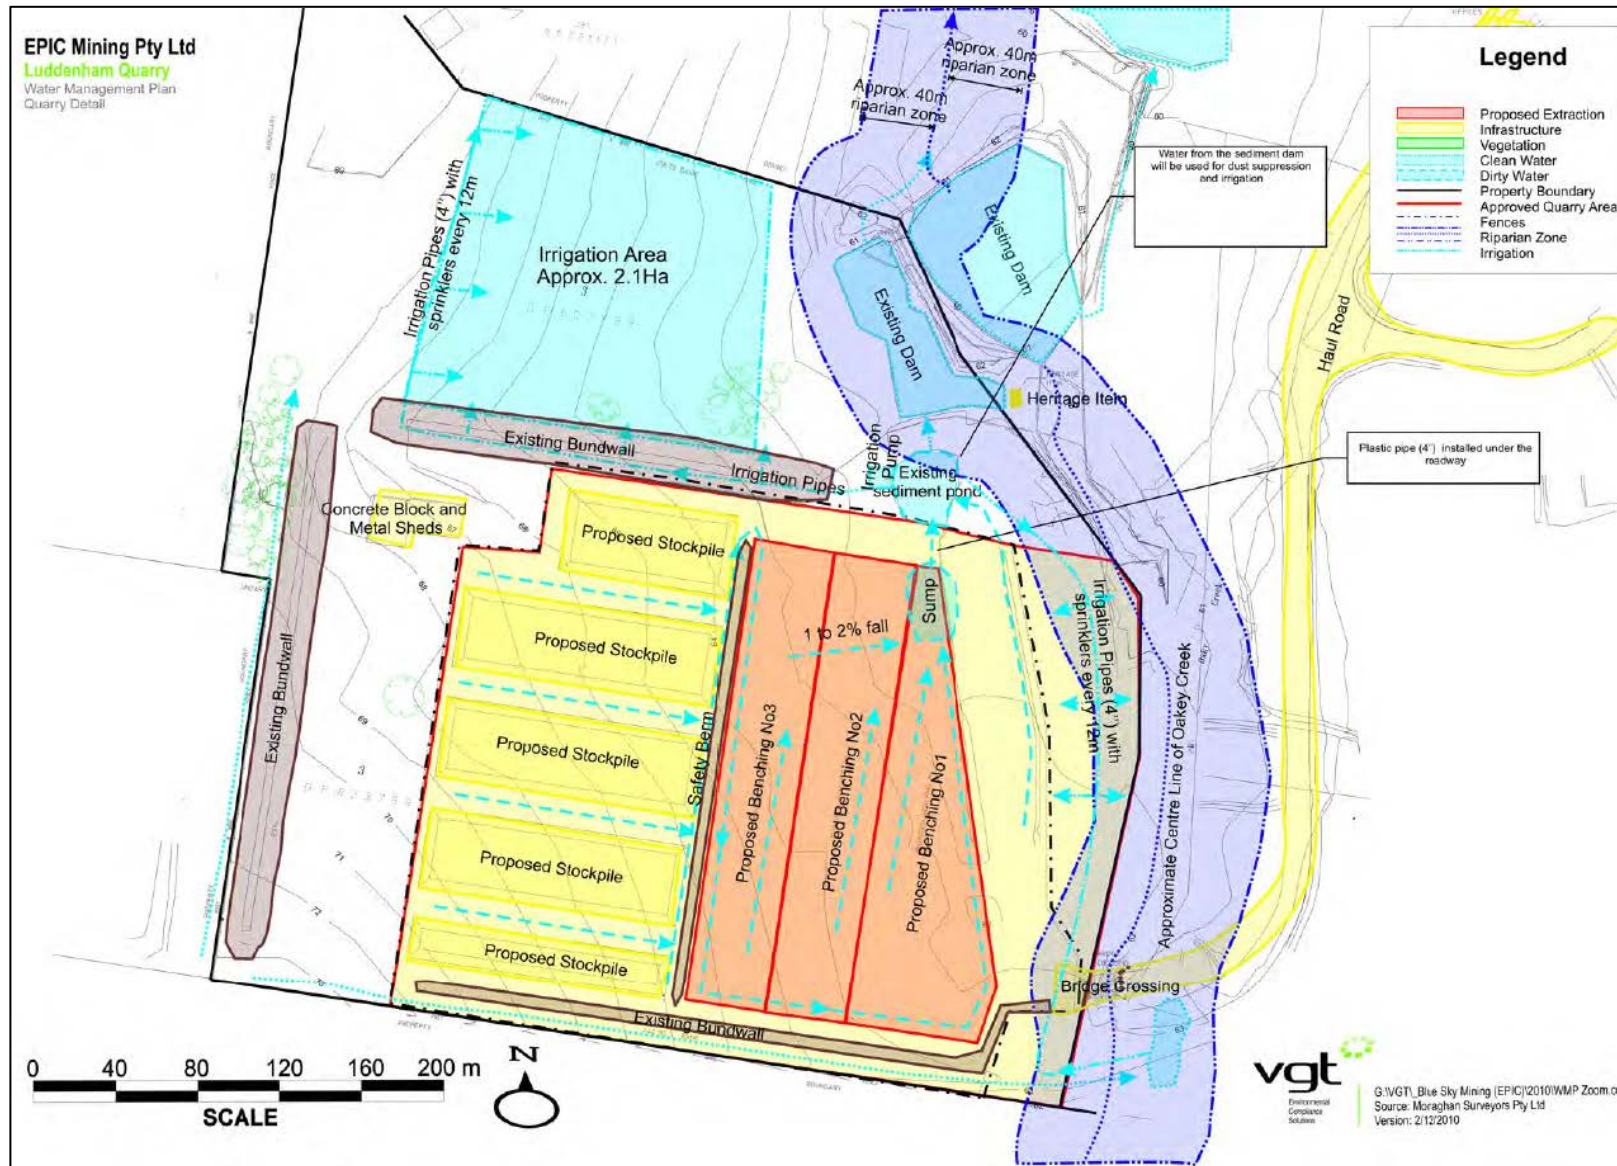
Conceptual Water Management Plan – Quarry Site (Lot 3)
